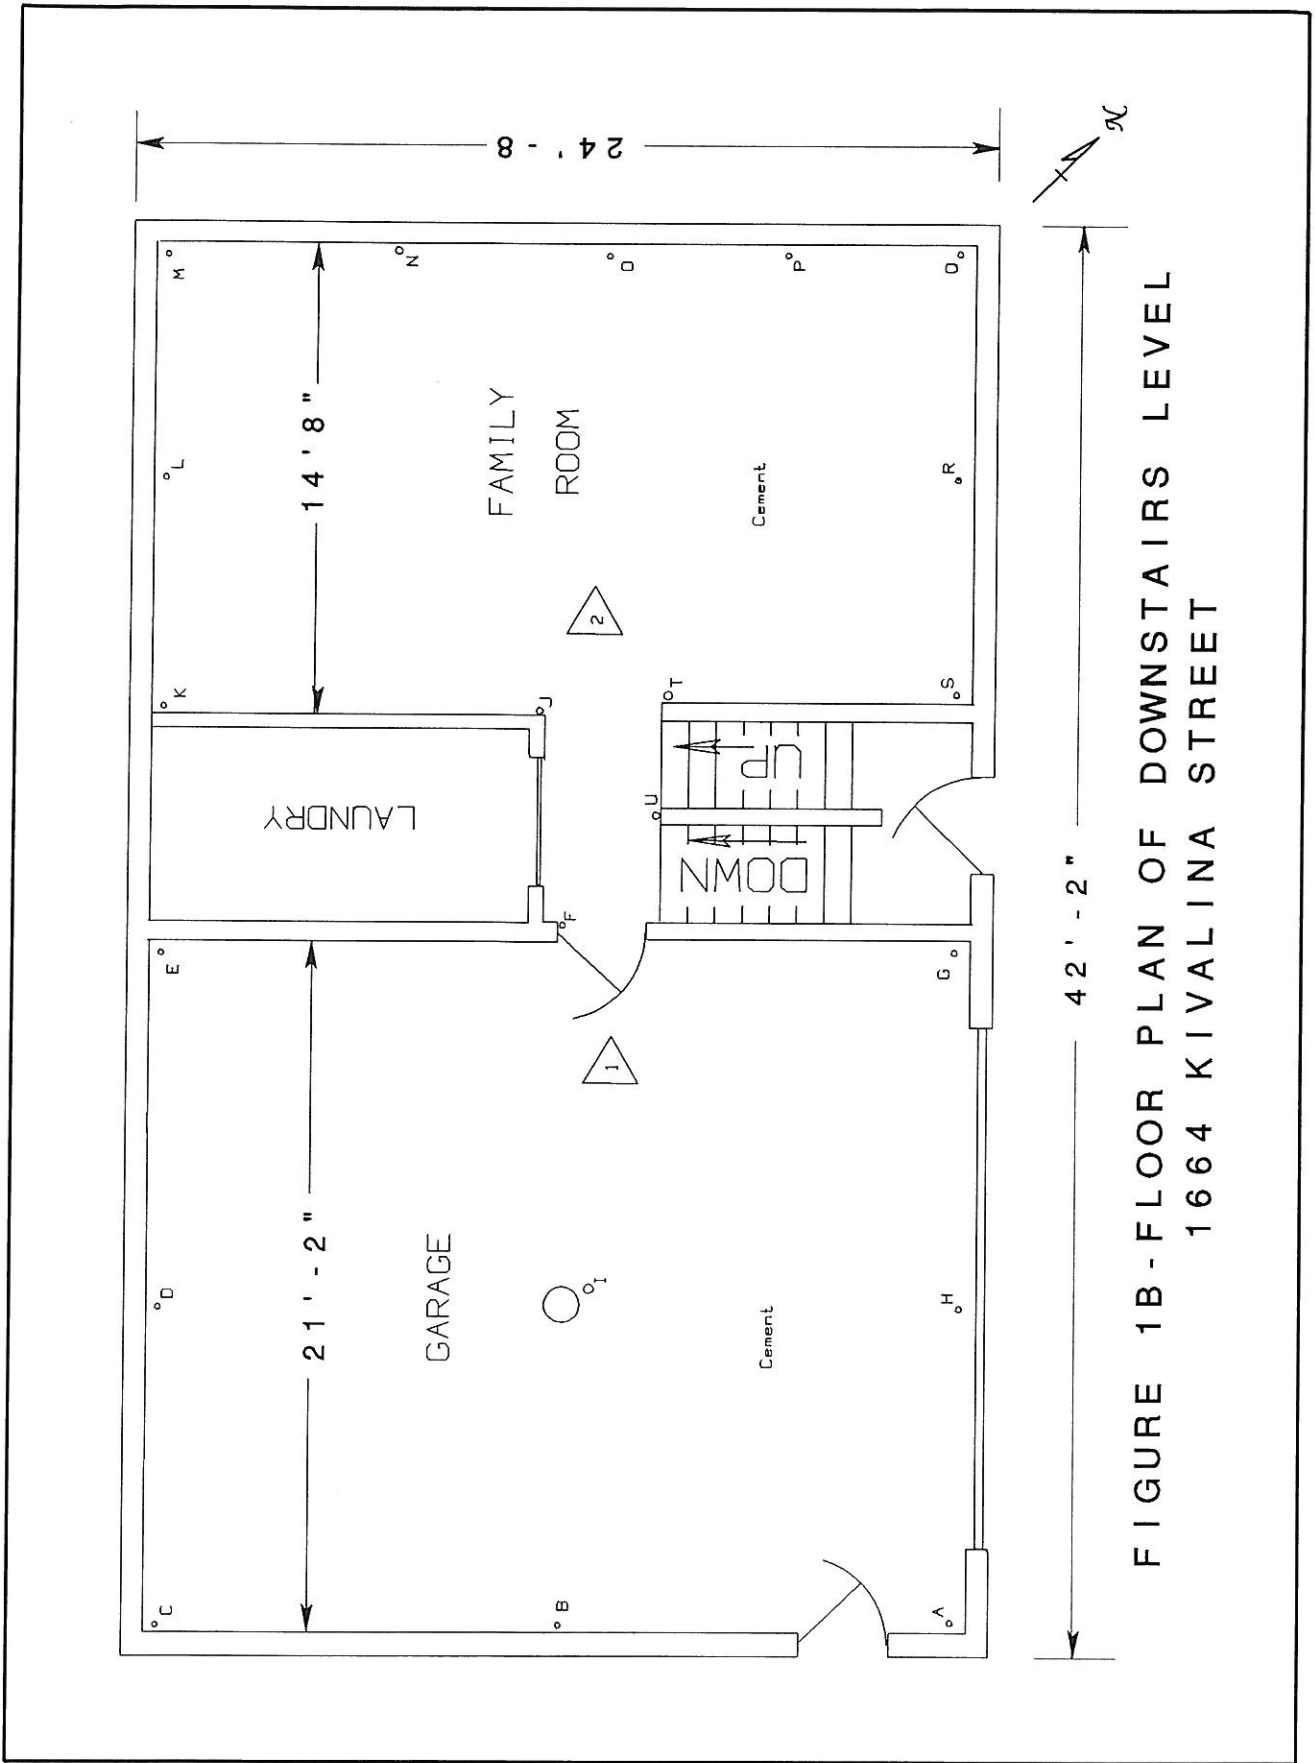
B - FLOOR PLAN OF DOWNSTAIRS LEVEL
